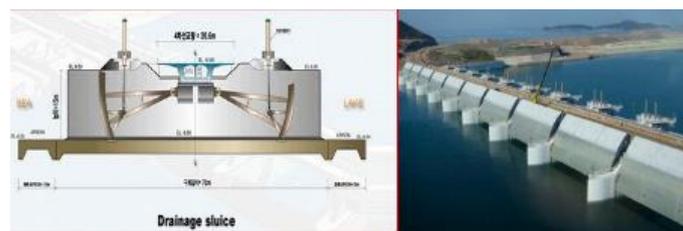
7. Cross Section of Sinsi and Garyeok sluices
